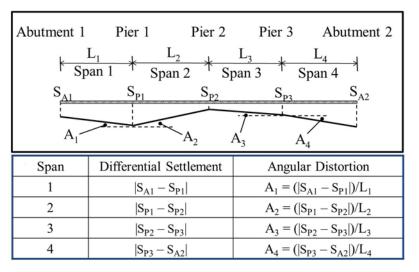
Schematic. Concept of settlement and angular distortion in bridges.
